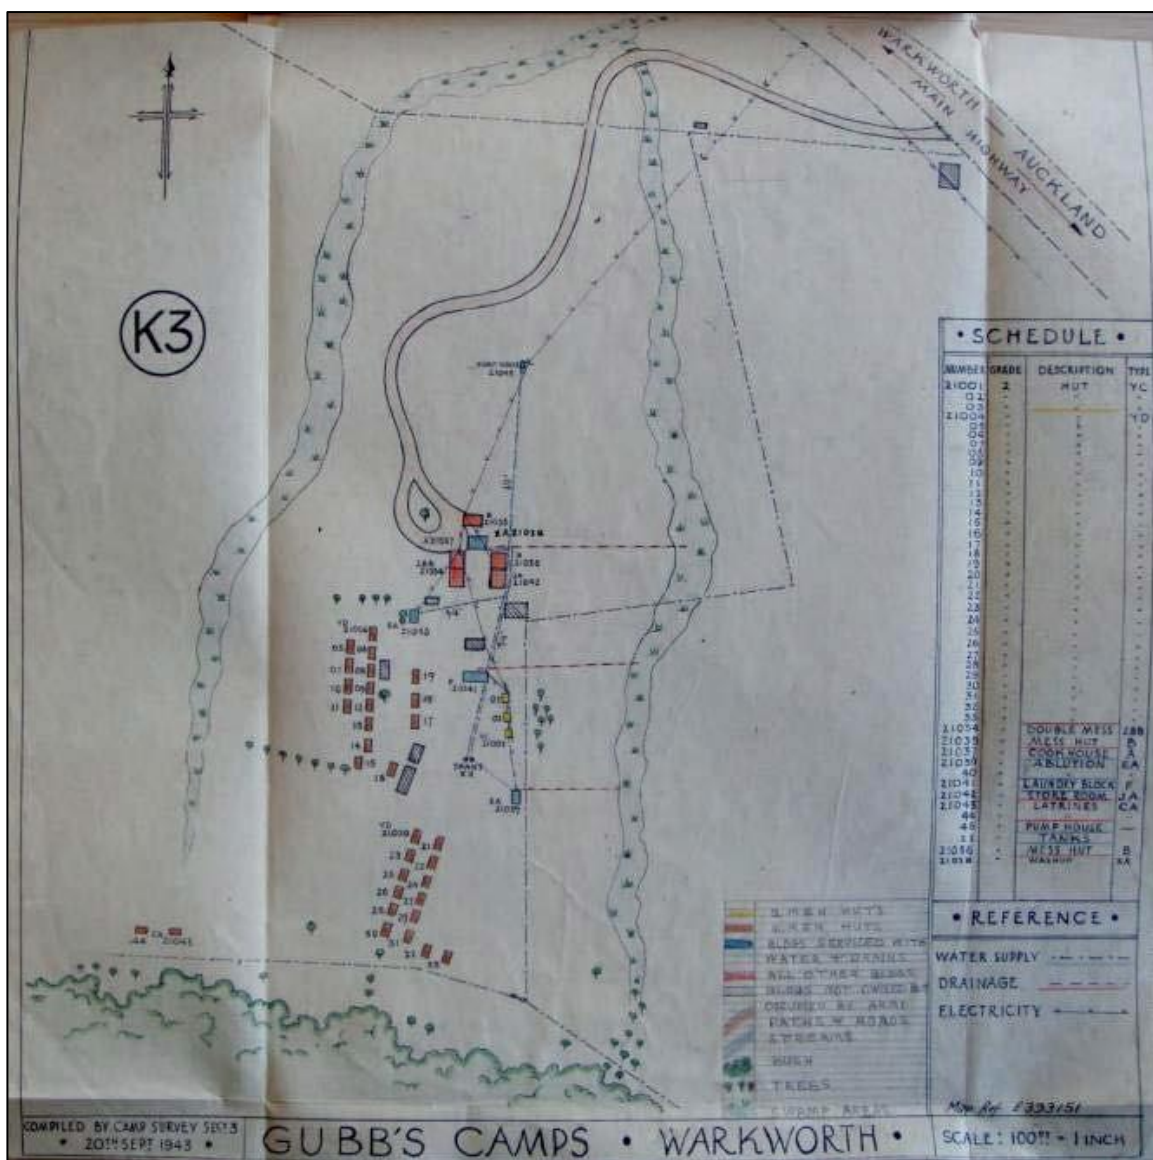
Plan detailing the layout of Gubbs Camp K3, situated along SH1 (source: Archives New Zealand, ACIO 8722 6/ 79/3)
